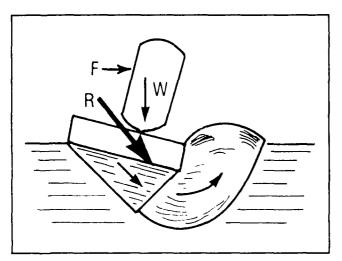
Bearing capacity or sinkage failure of footing on cohesive sediment, inclined eccentric loading. F = horizontal force acting on structure; R = resulting force acting at structure bearing surface.
